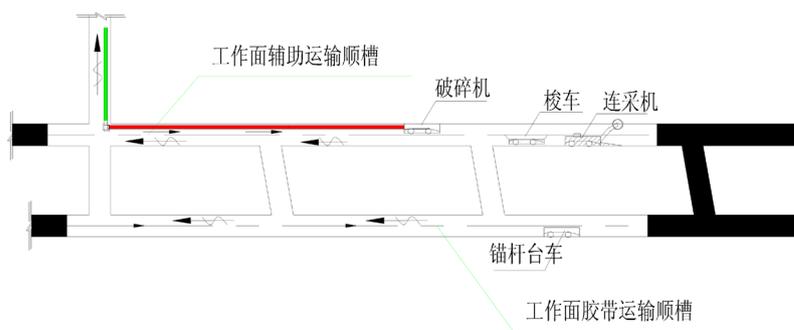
Schematic diagram of double-lane tunneling equipment layout
